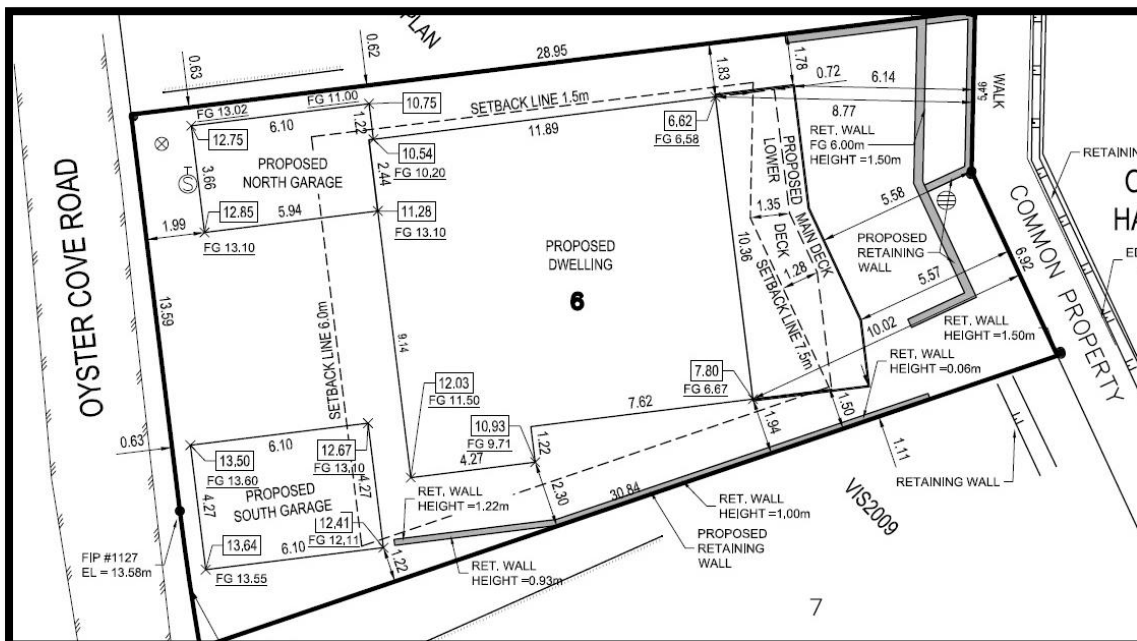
Proposed site plan at 6-245 Oyster Cove Road.
